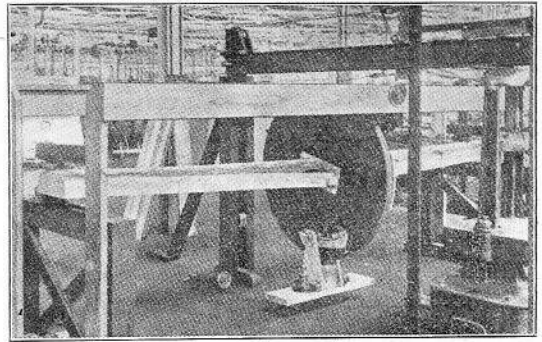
Rig for testing Beams in Combined Torsion and Bending assembled with Universal Testing Machine.
